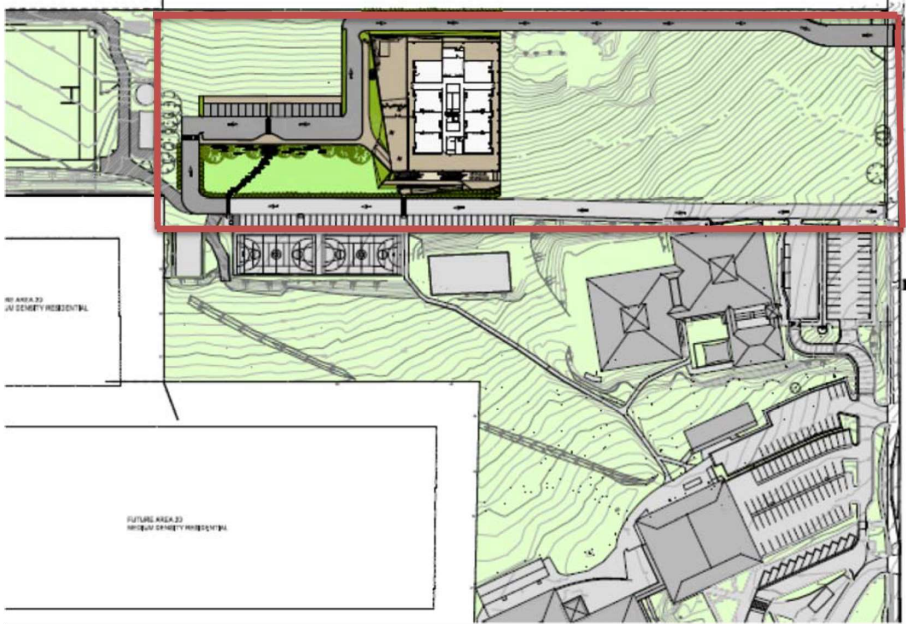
Stage 2: Construction of Junior Classrooms and second stage of car parking internal road network
